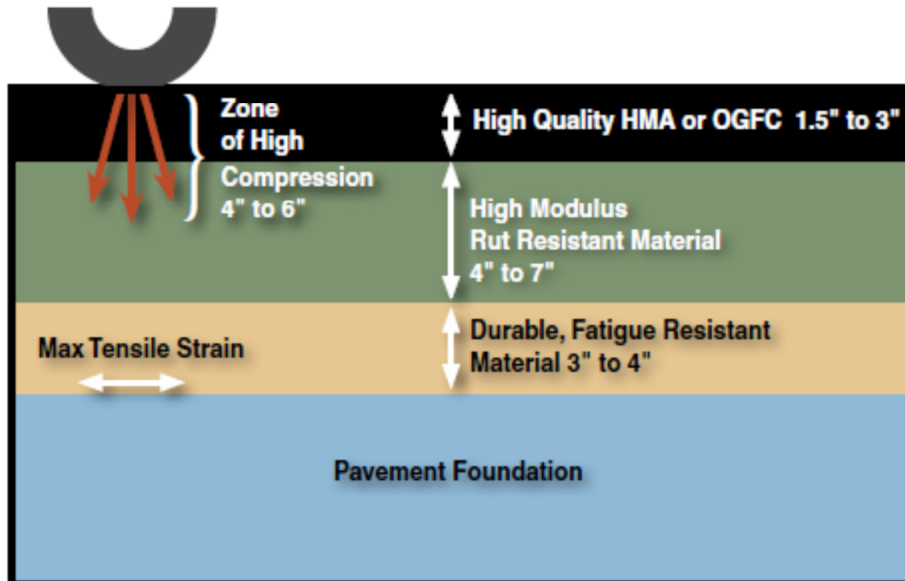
Perpetual Pavement Design Concept [Newcomb, Buncher & Huddleston, 2001]
